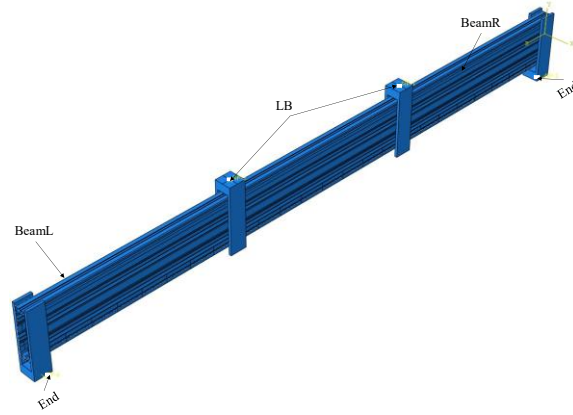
Assembly of the parts to resemble the four-point bending setup.
